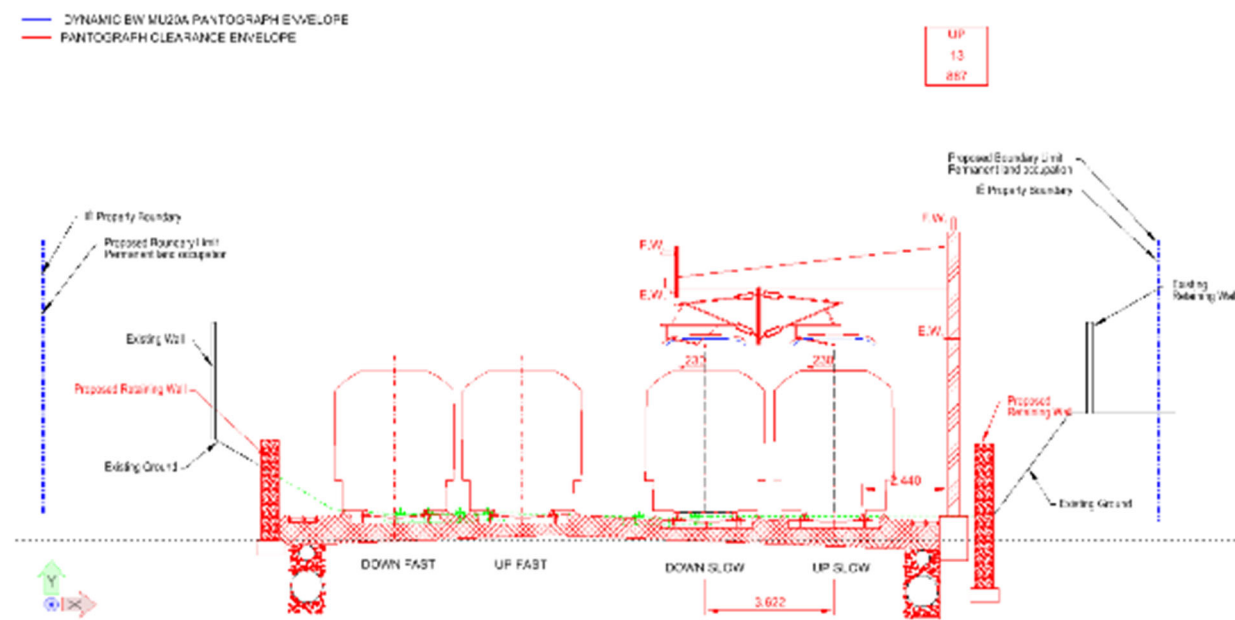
Example OHLE TTC Arrangement in a Four-track Open Route – Facing West
